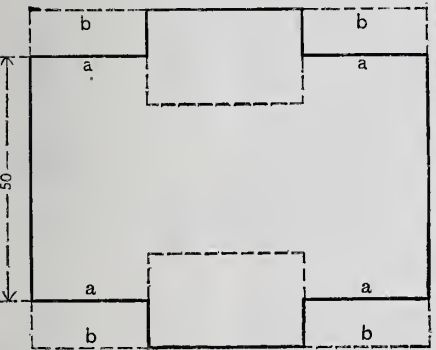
A Change Obtaining Larger Floor Space with the Same Walls.
